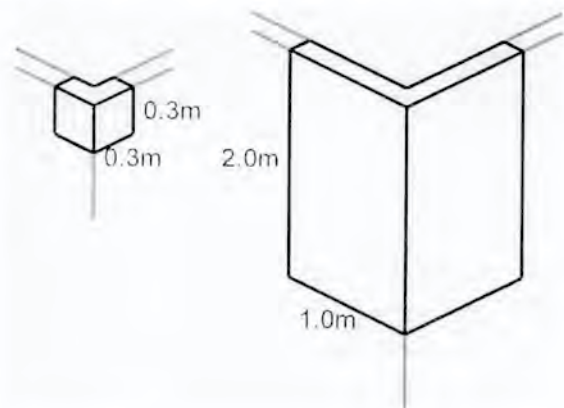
Recommended dimensions of the sheet metal caps for the protection of corner structures of low buildings (left) and tall buildings (right).
